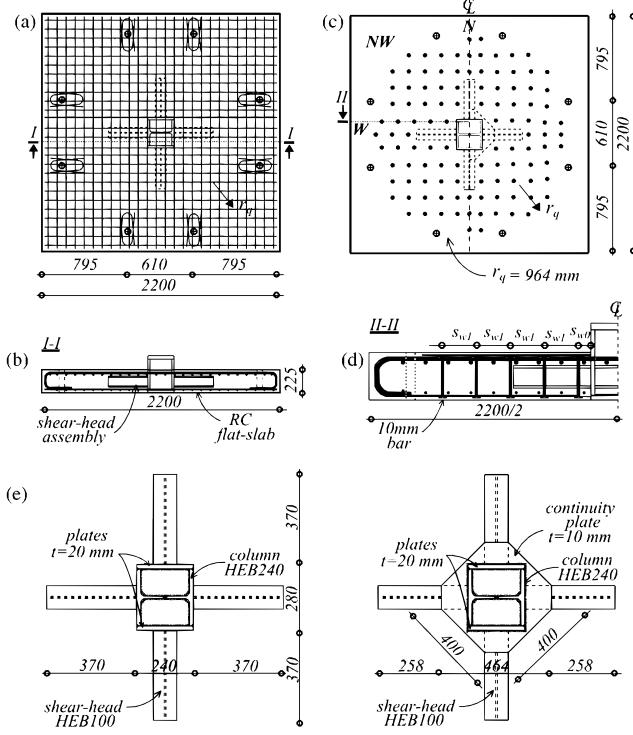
Specimen arrangement [Bompa and Elghazouli \(2016\)](#); a) Longitudinal reinforcement layout; b) I-I cross-sectional view; c) transverse reinforcement layout; d) II-II cross-sectional view from transverse reinforcement; e) Shearhead details, without continuity plate on the left and with continuity plate on the right.
